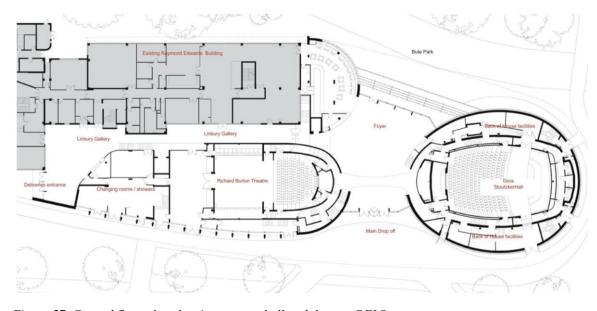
, Ground floor plan showing concert hall and theater. BFLS
